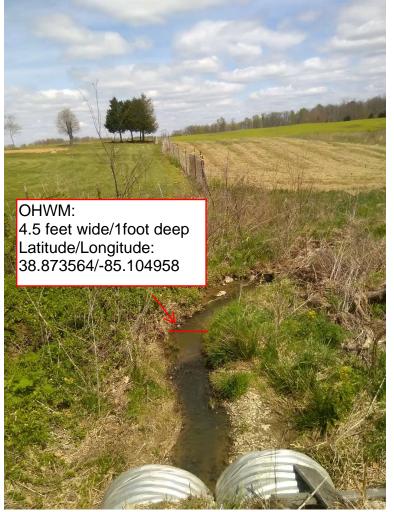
Facing north at UNT 1 to Bear Branch and structure outlet from SR 250. (4.16.21)
